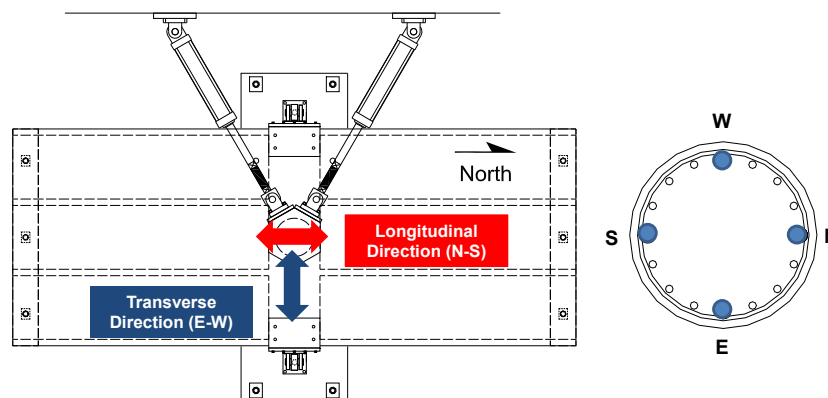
Notation of loading direction and layout of instrumented column rebars
